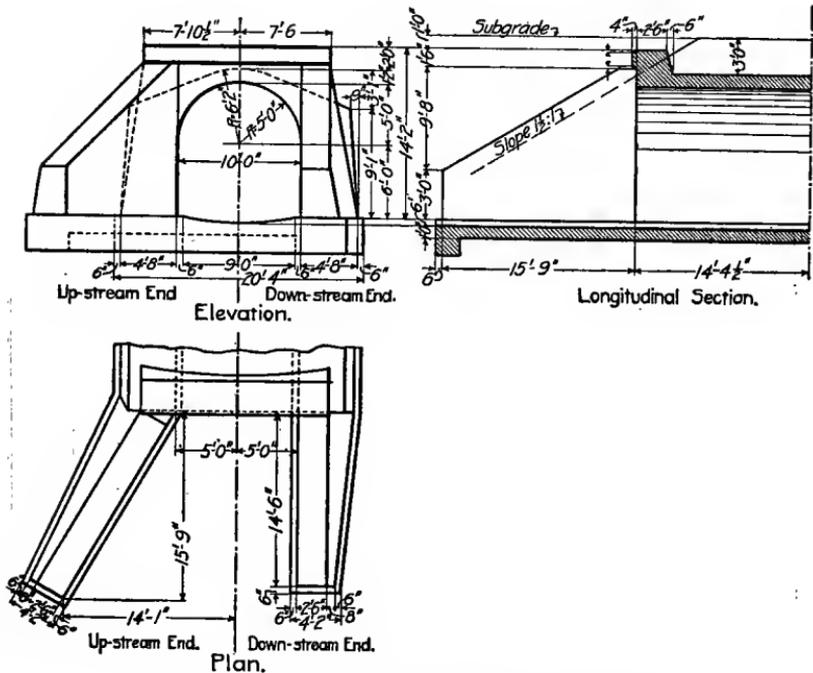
ERIE STANDARD PLAIN CONCRETE ARCH CULVERT.
